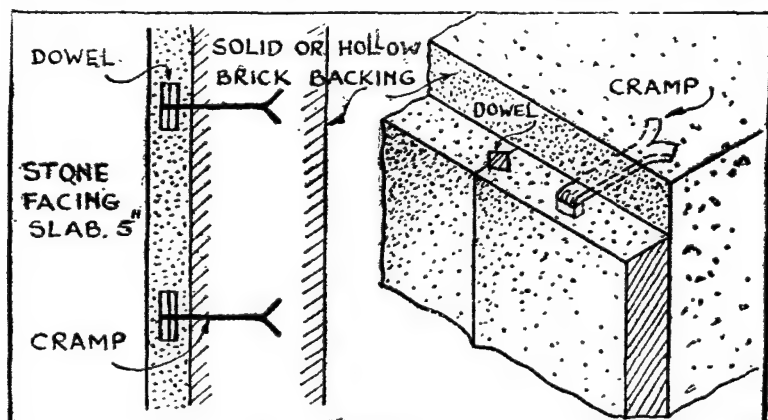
and 168. Stone facing to brick concrete backing in plinth and parapet.
